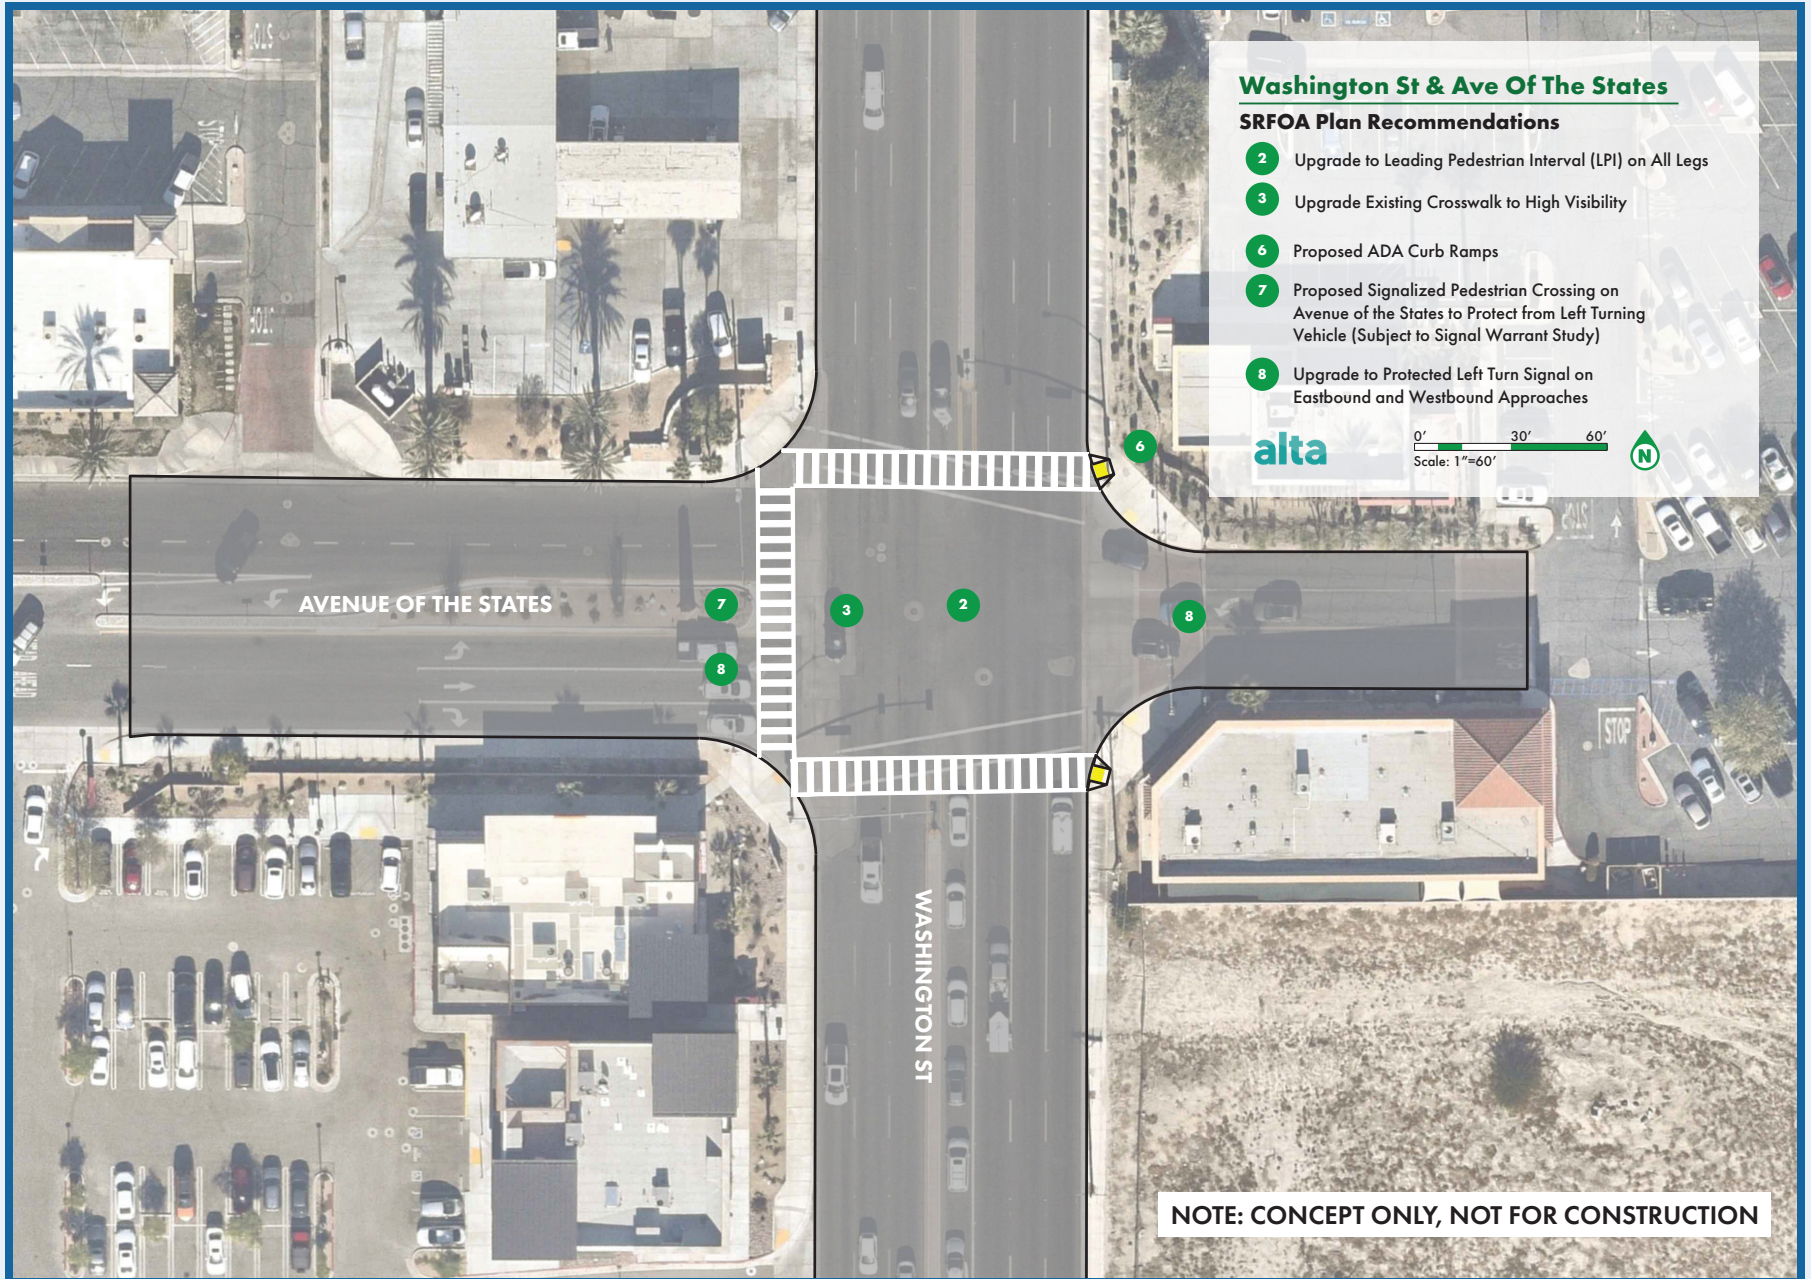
Washington Street / Avenue of the States Concept Plans (8/8)
